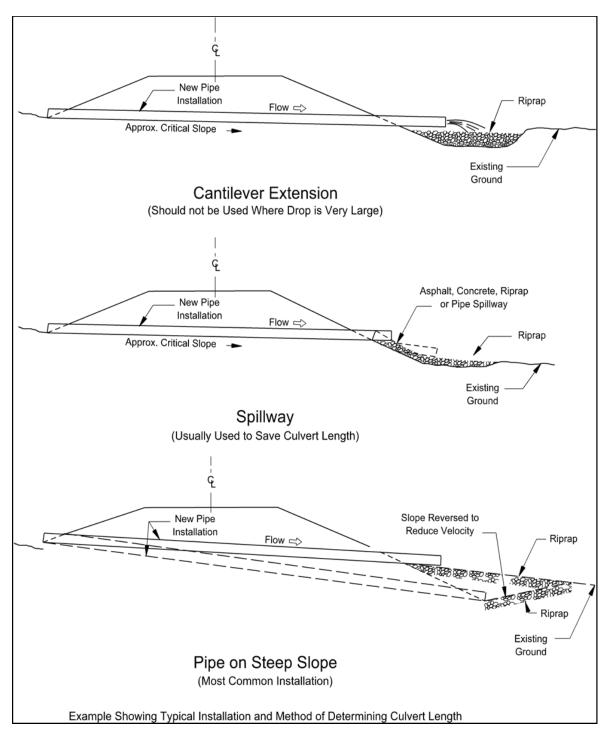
INLET TO OUTLET ELEVATION CHANGE
